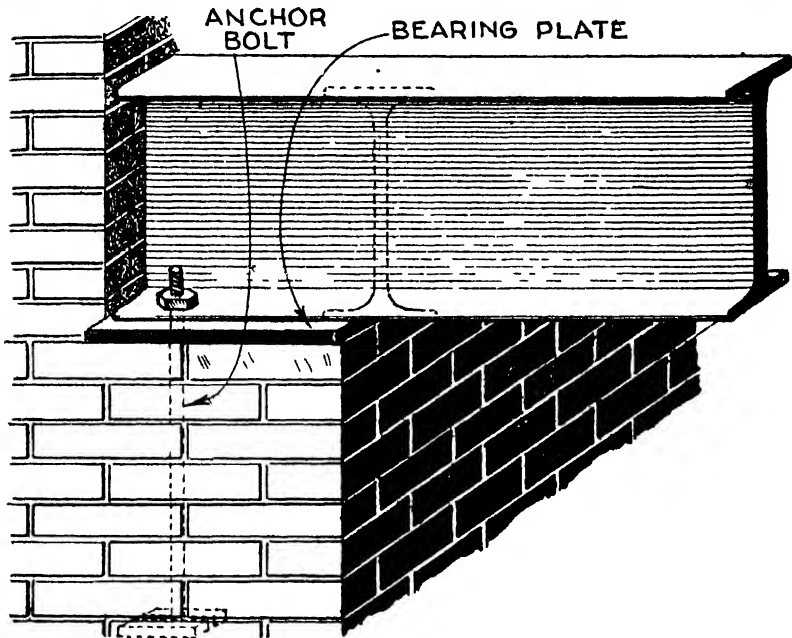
,621 — I beam on bearing plate and anchored with anchor bolt
